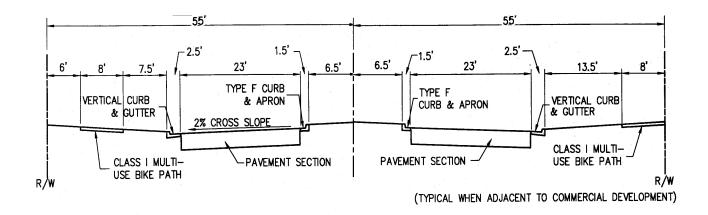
DE ANZA BOULEVARD CROSS SECTION
